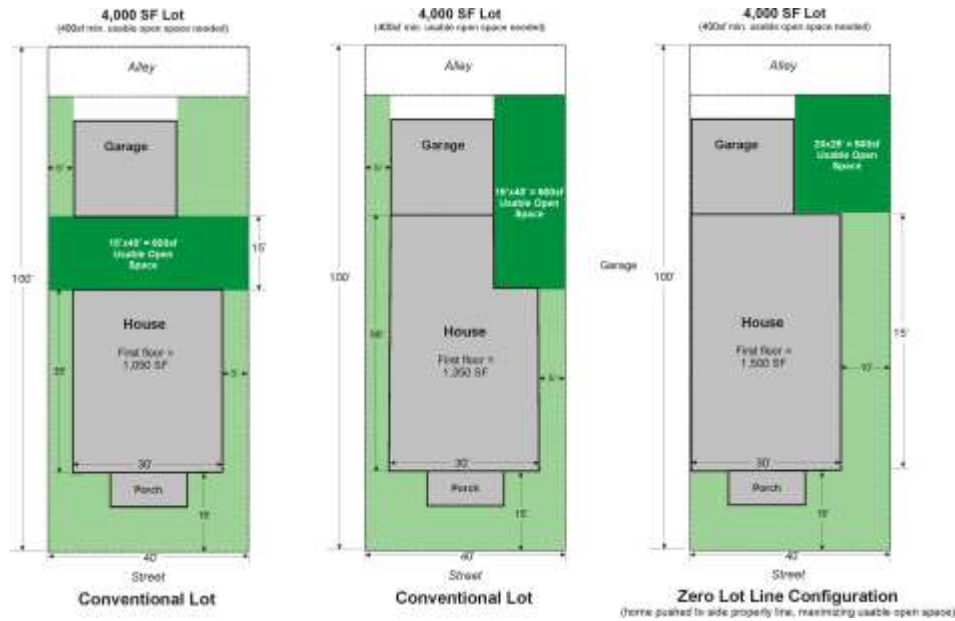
Examples of alley loaded lots meeting minimum usable open space standards.
